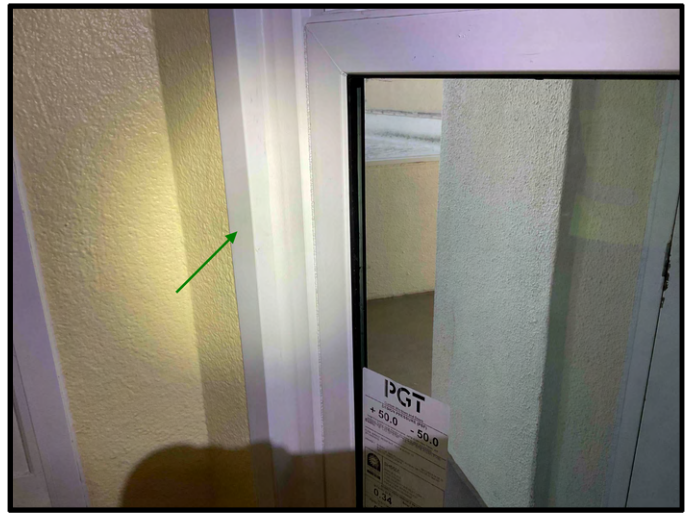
Unit No. 202 - View of new interior trim pieces installed at window with new sealant installed from frame to trim and from trim to wall.
